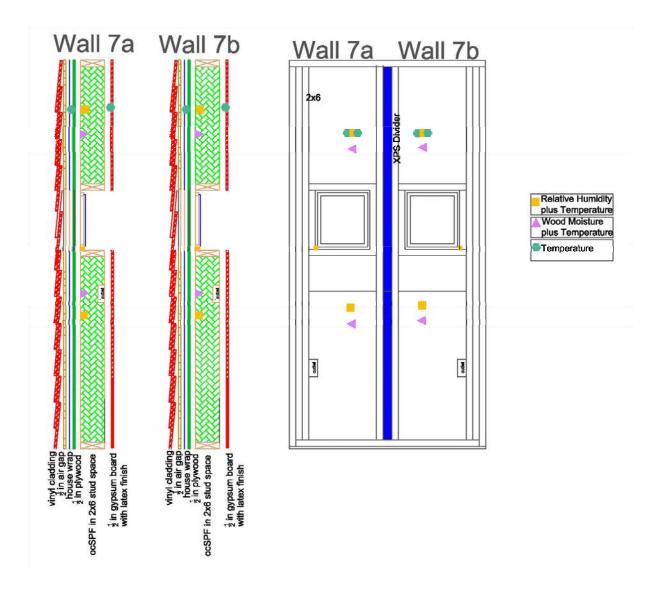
Elevation of Wall 7. Sides A and B had the same configuration, each with a different brand of ocSPF. Wall 7 had no vapor retarder at all.
